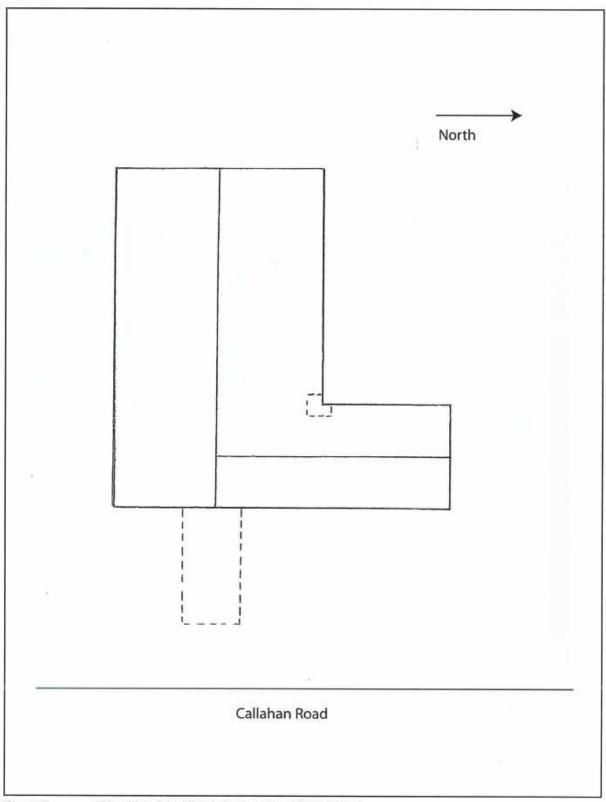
Plan view of the historic Galena Creek Schoolhouse.
